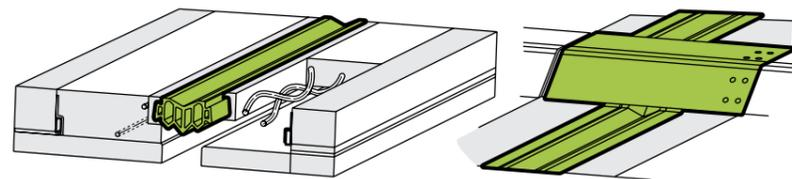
Detail of the footpath joint. Right: kerb cover plate.
